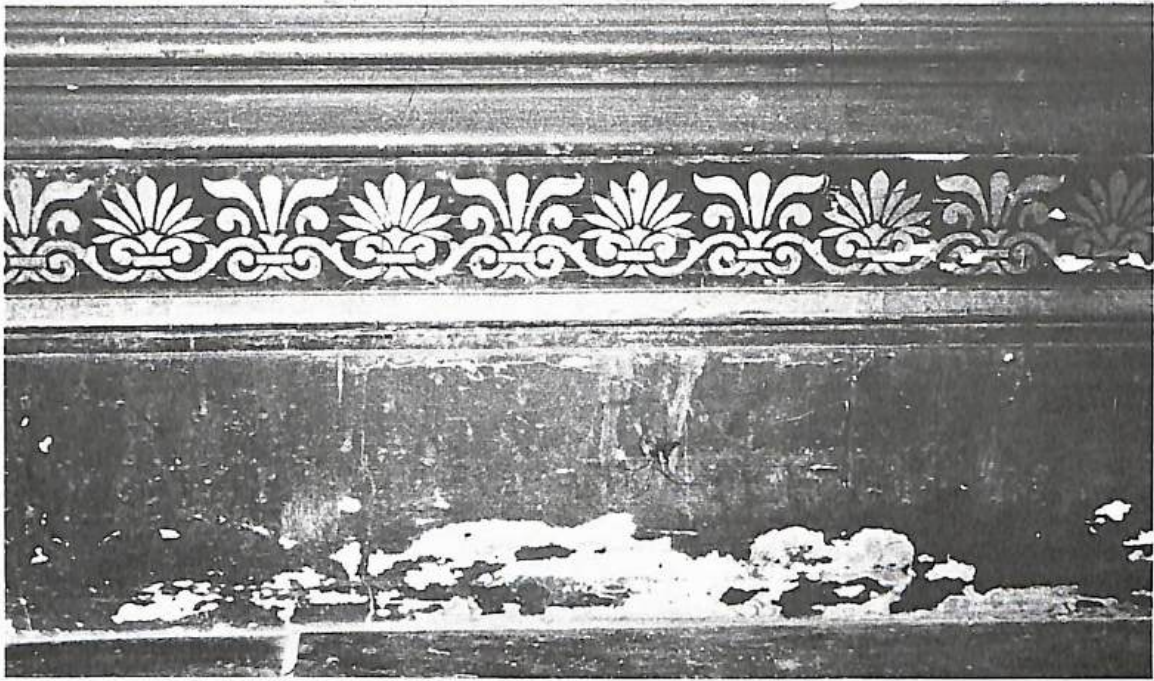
Stencilled Decoration: Ground Floor Hall and Drawing Room Skirtings.
